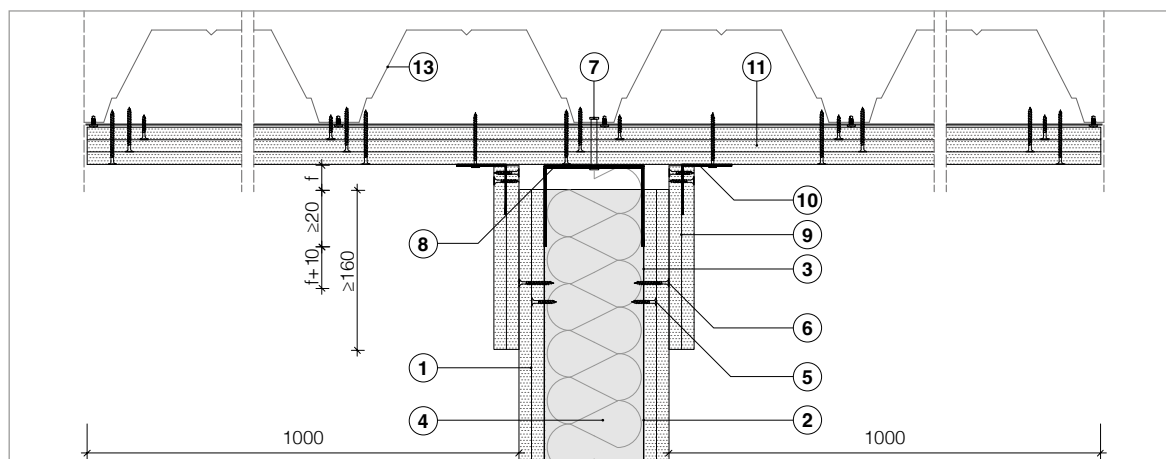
Connecting a wall with a ceiling with combustible covering – the use of plasterboard lining
